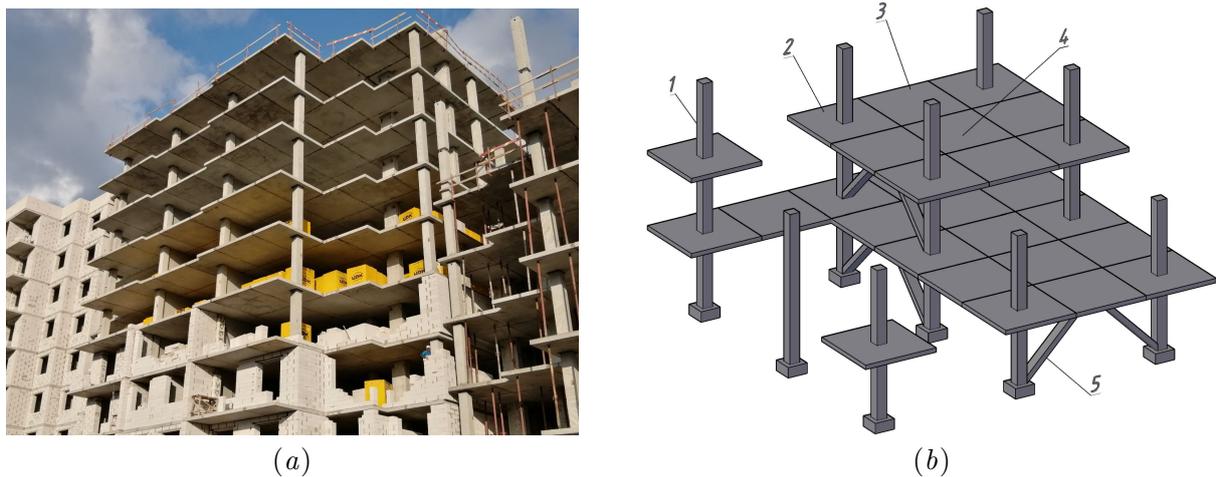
Precast flat plate frame structural system of buildings: (a) a building under construction and (b) the general view of the structural system: 1 – column; 2 – over-columned plate; 3 – inter-columned plate; 4 – middle plate; 5 – linear brace.
